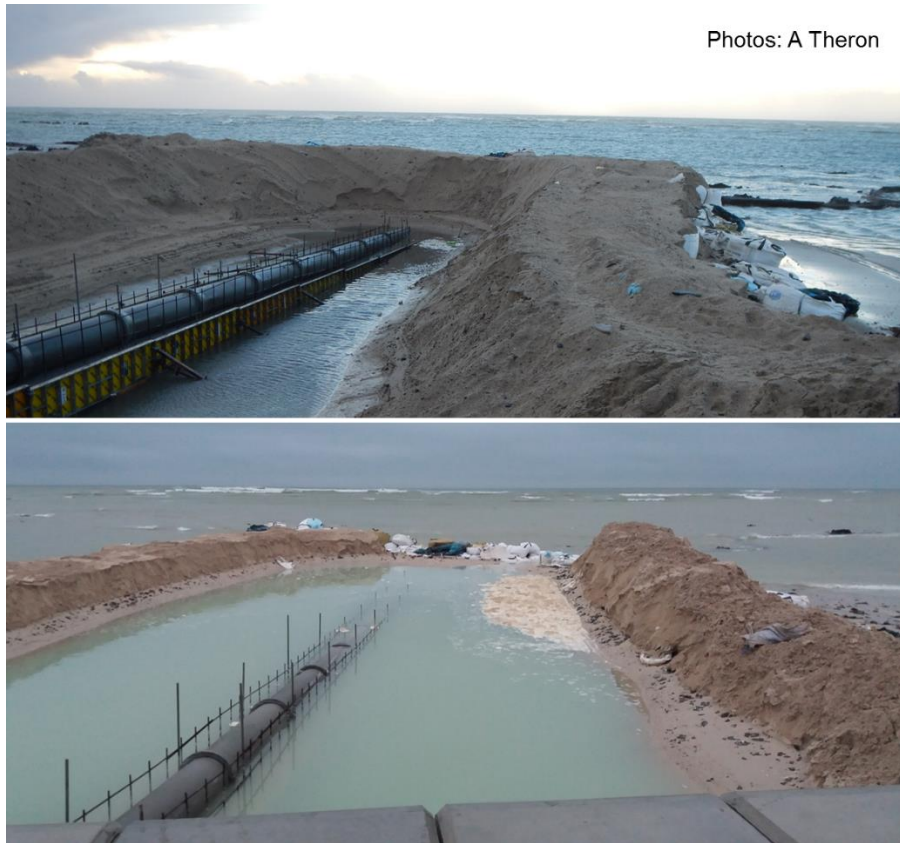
A cofferdam with sheet piles and dewatering for large scale construction in the dry in the Middle East
